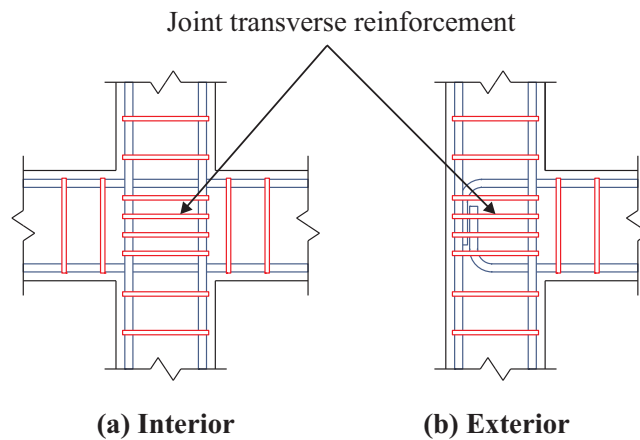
Typical reinforcing details in ductile beam-column joints
